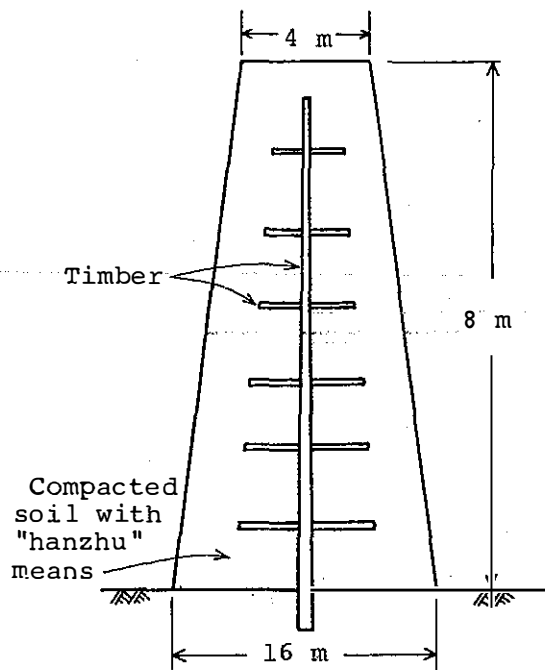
Conceptual profile of the typical city-castle wall built of soil and timber
